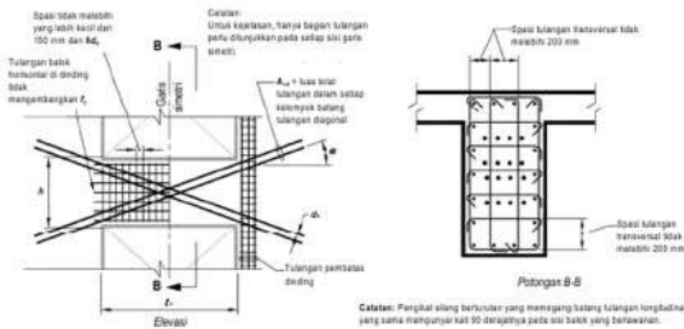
Diagonal reinforcement with full restraints cross section of diagonal reinforced concrete blocks
